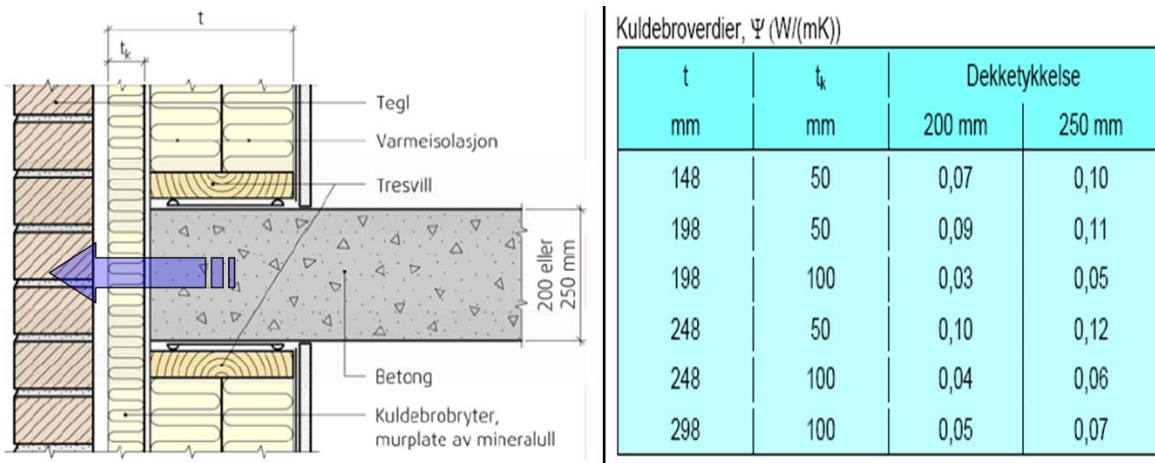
Avoid thermal bridges with external insulation. Values in the table show thermal bridge values for different construction details
